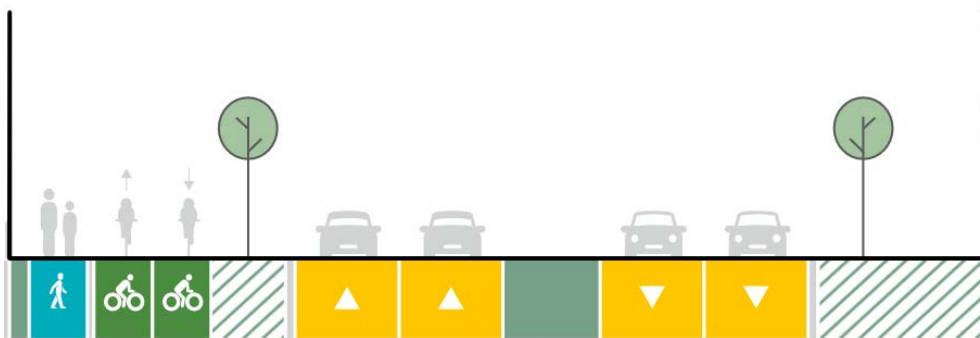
Access Road – rural edge cross section (Segment 1)
